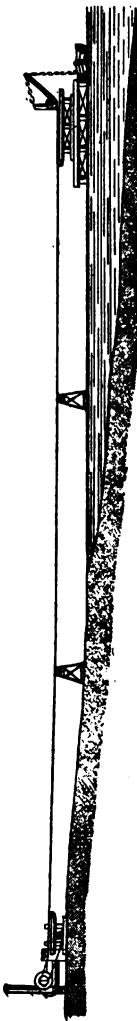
Wire-Rope Tramway arranged as a Pier.
